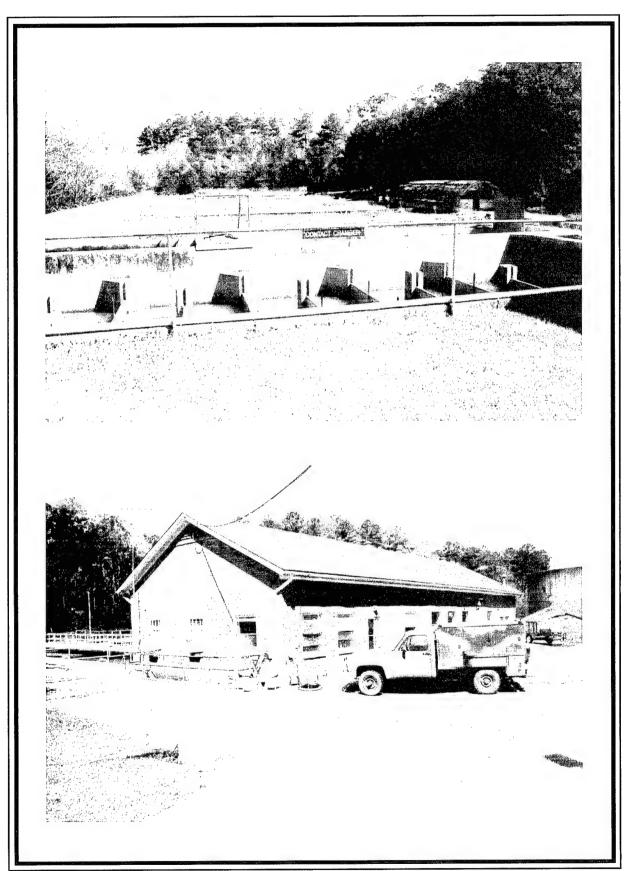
Wastewater Treatment Plant No. 1. Top: drying beds, looking north; Bottom: Building 5590, looking northwest.
